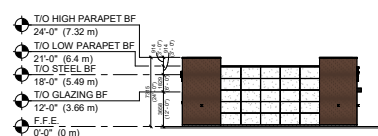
Commercial Building F West Elevation (typical concept design for commercial buildings on proposed site)
